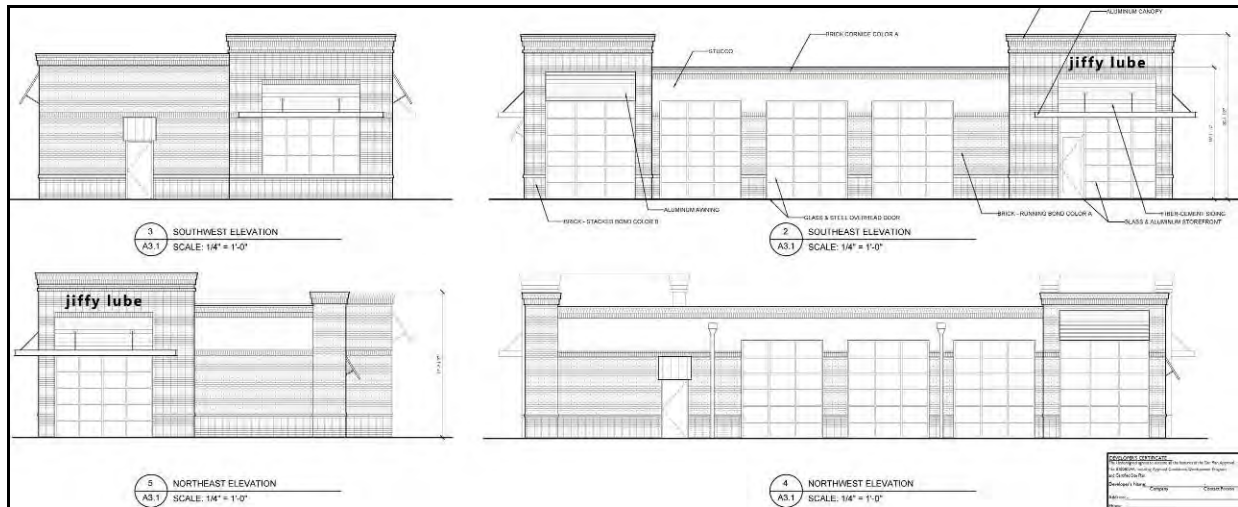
Proposed Site Plan Amendment- Architectural Elevation for Automobile Service, All Sides
